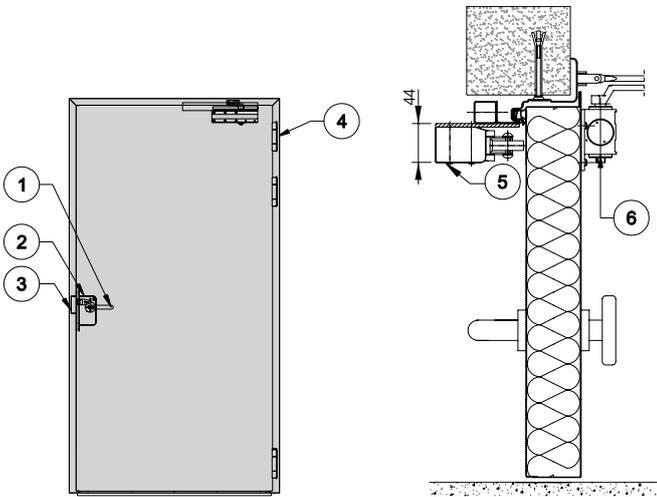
Diagram of the single-leaf door, vertical cross-section including the ventilation system
